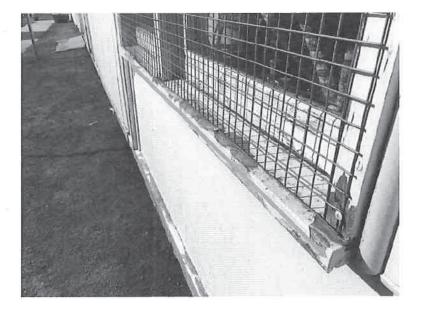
Exterior surfaces after removal of flaking and peeling lead paint
